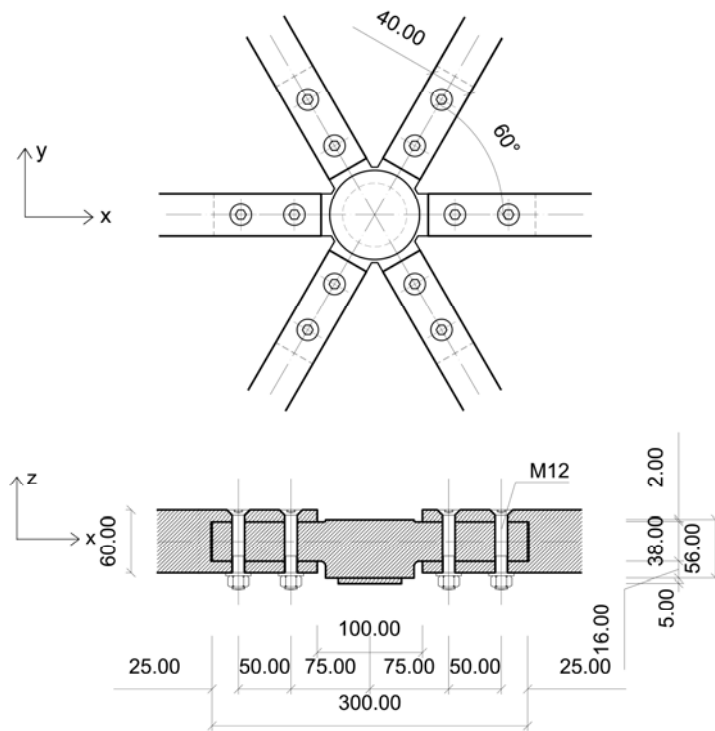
Details of SBP-3 (mm) [Schlaich et al 2003]
